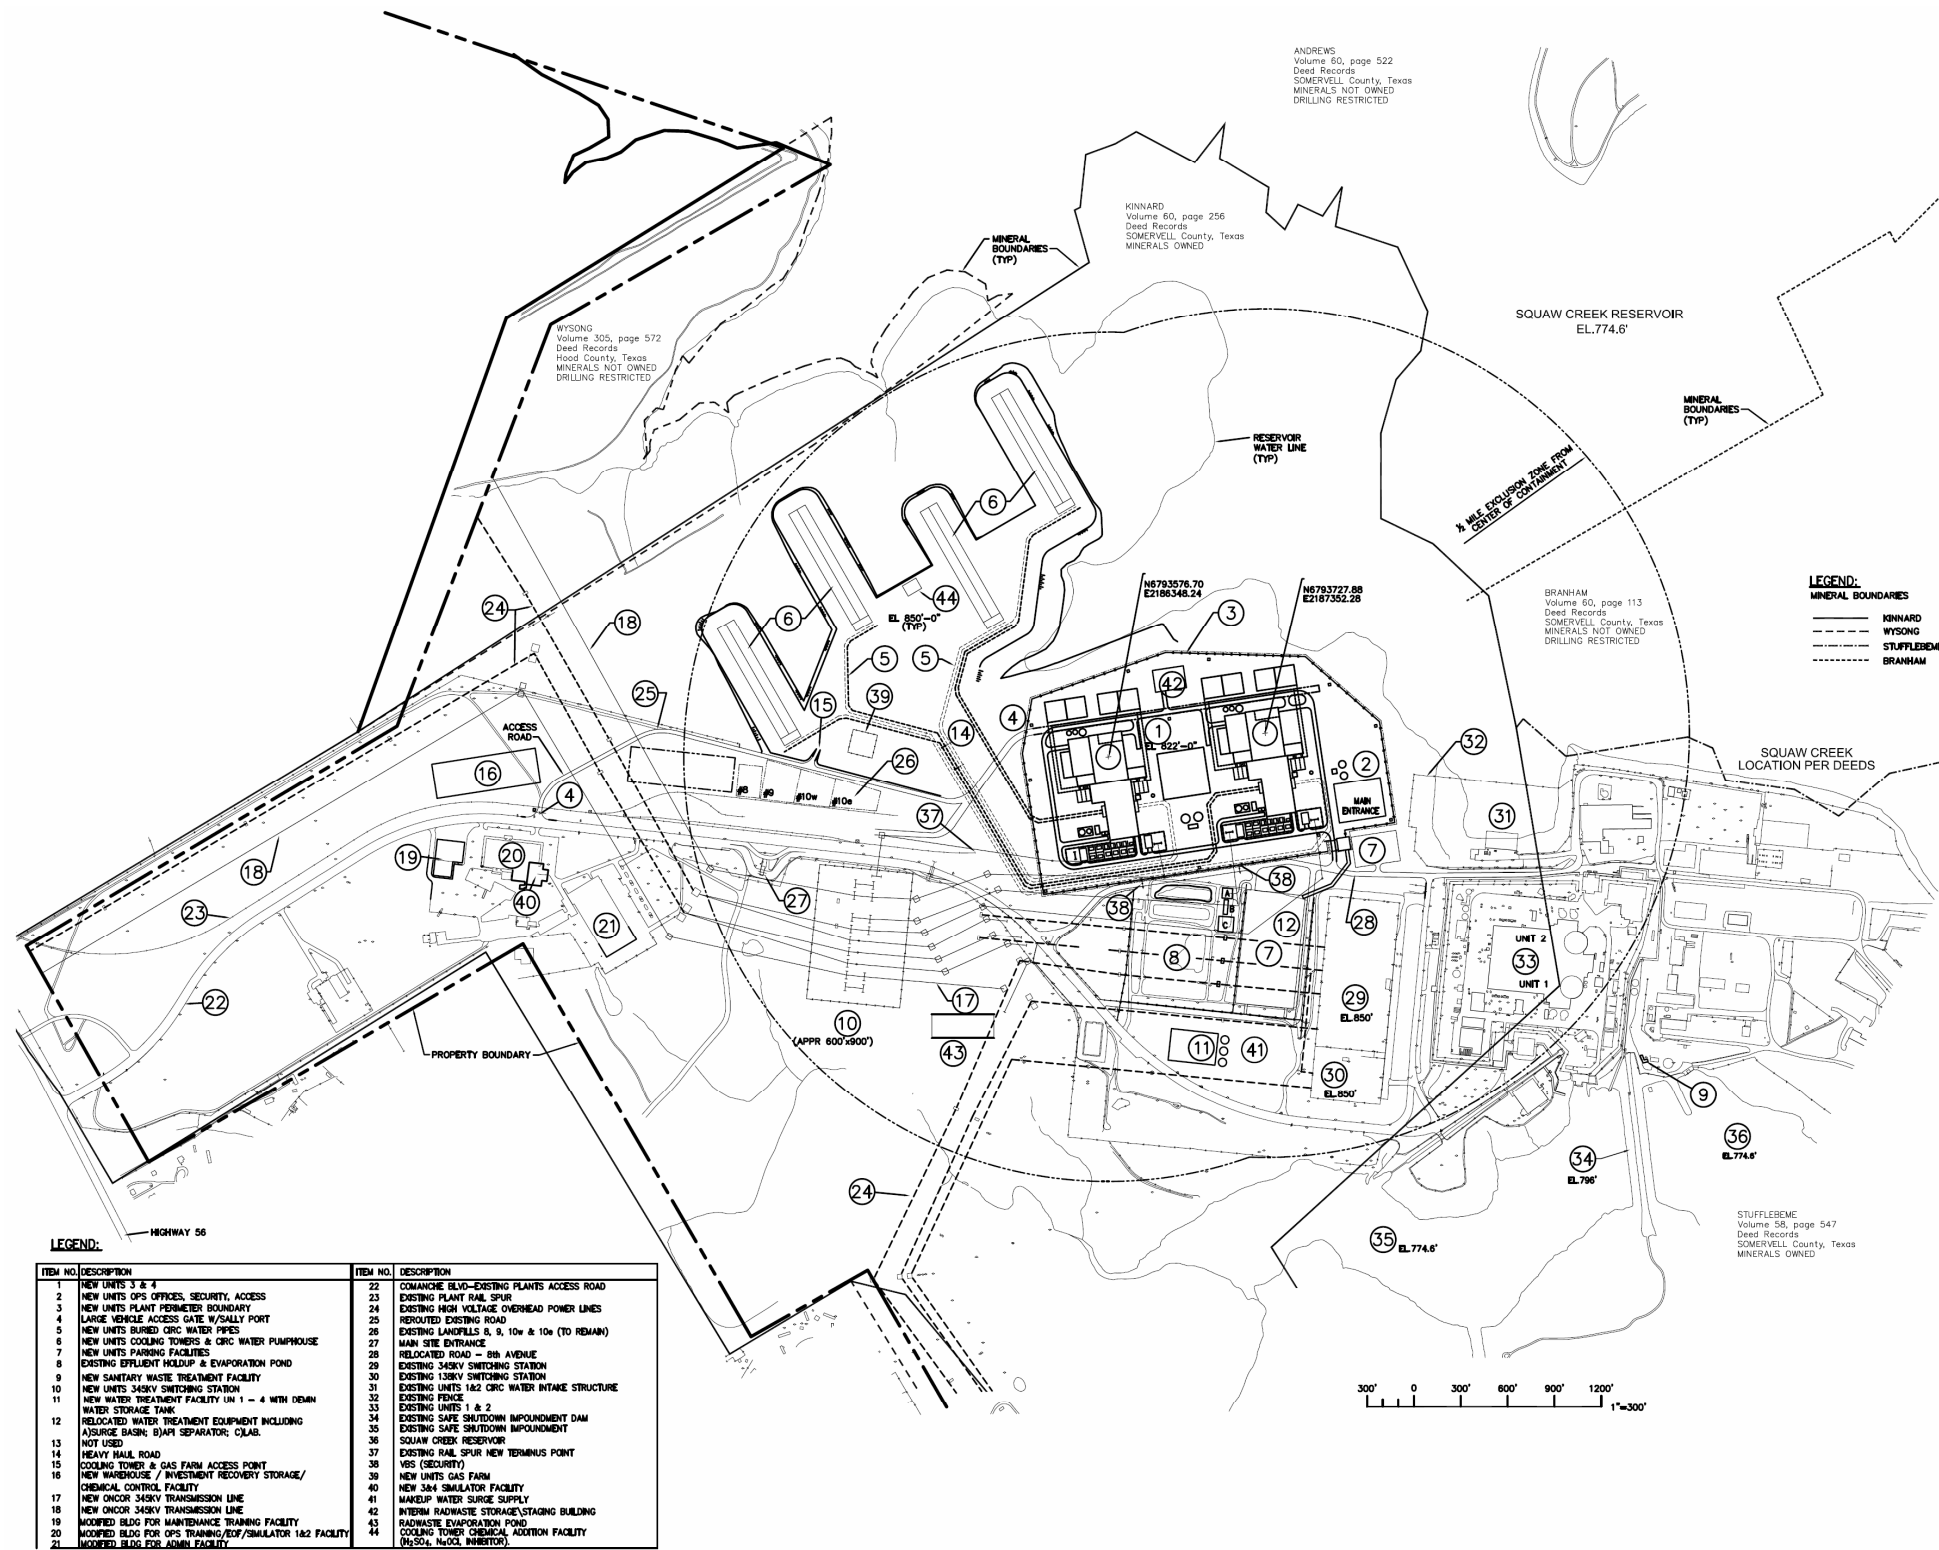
R Comanche Peak Units 3 & 4 Site Plan (Sheet 1 of 2)
